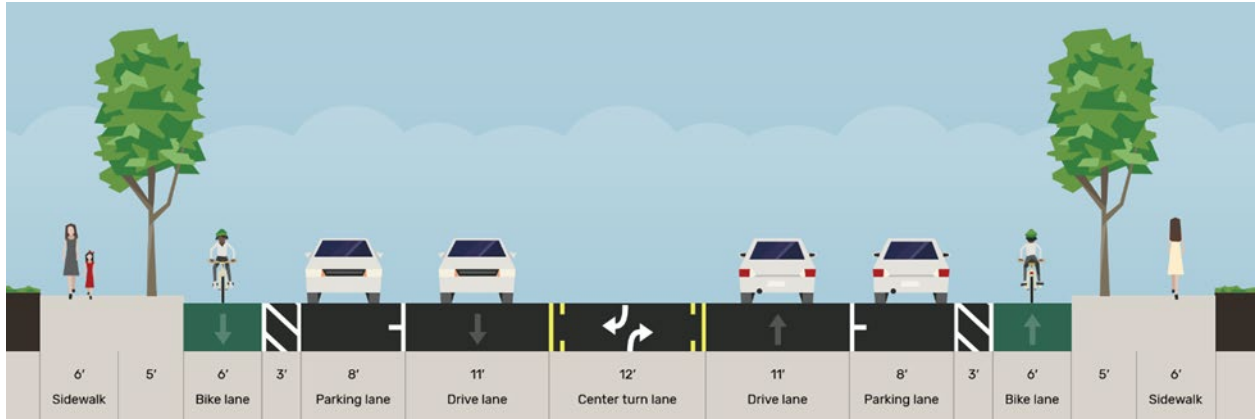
Cross section diagram of design recommendations with bike lanes and on-street parking (assuming 90' from outside of sidewalk to outside of sidewalk).
